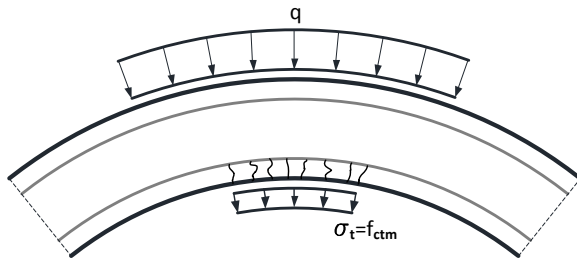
Spalling failure in arched-shaped member, adapted from (Leonhardt & Monnig, 1979)
